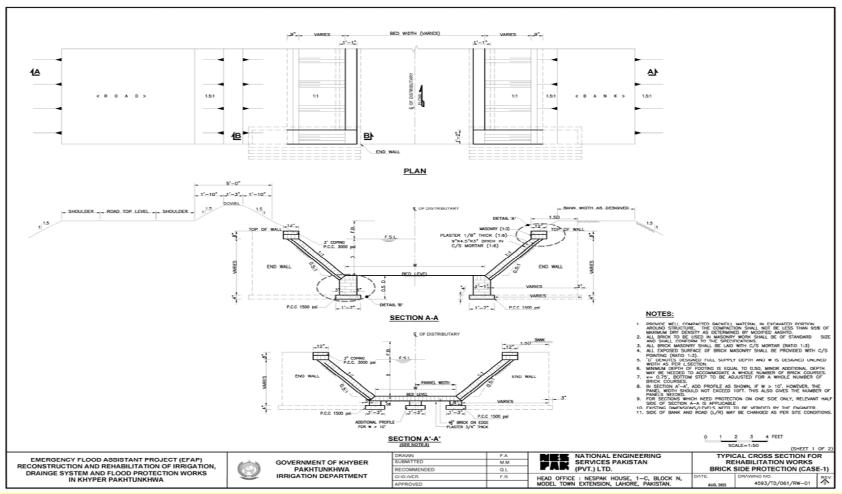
Typical Cross section for Rehabilitation works Brick Side Protection Wall
